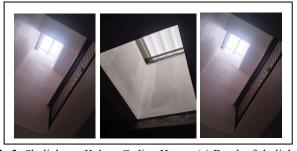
Skylights at Kelapa Gading House: (a) Depth of skylights.(b) Skylight from the 1st floor. (c) Skylight from the 2nd floor.
